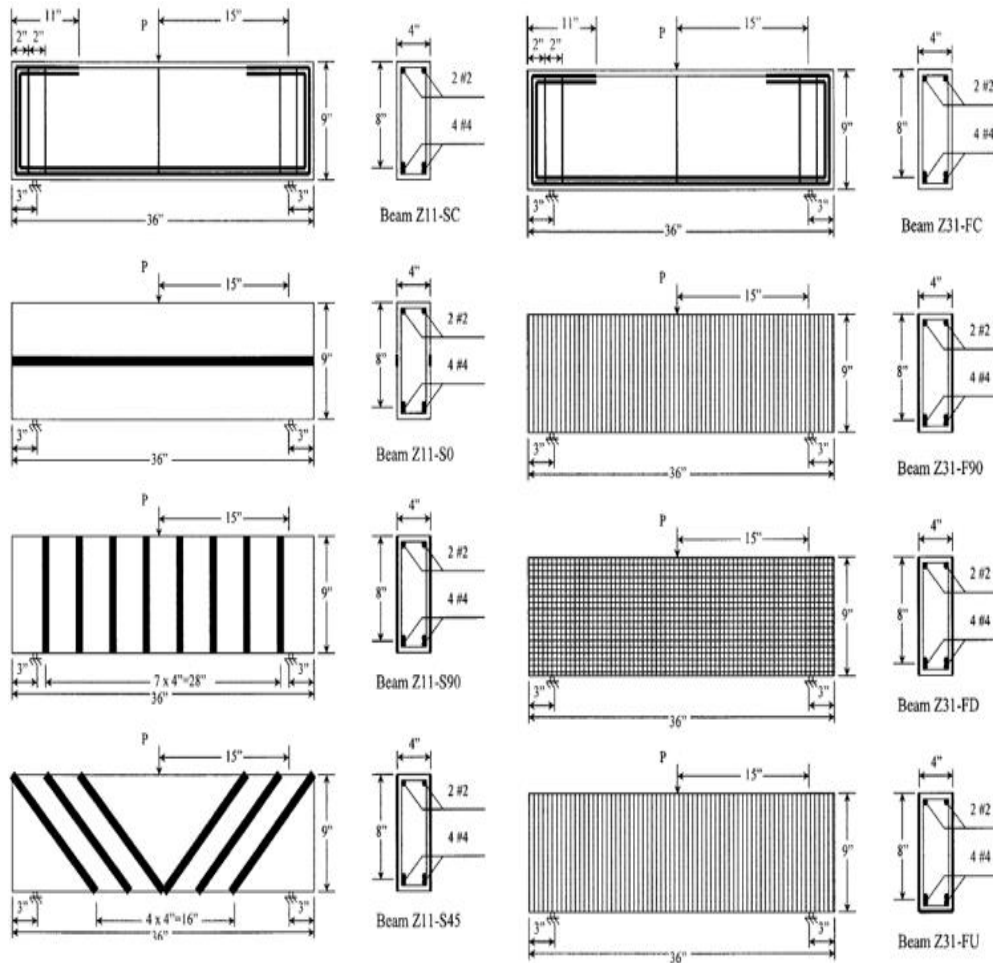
CFRP Strips and CFRP Fabrics Detailing (Zhang, et al. 2004).
